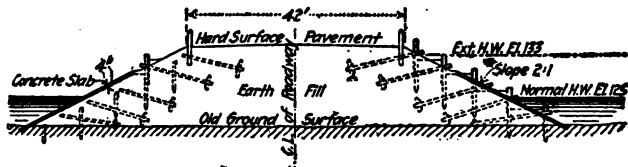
Bulkheads for Retaining Hydraulic Fill for Embankment Approach to Columbia River Bridge.
